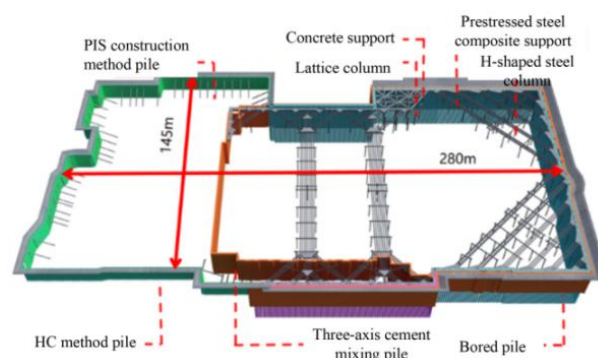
Three-Dimensional Schematic Diagram of the Foundation Pit Support
